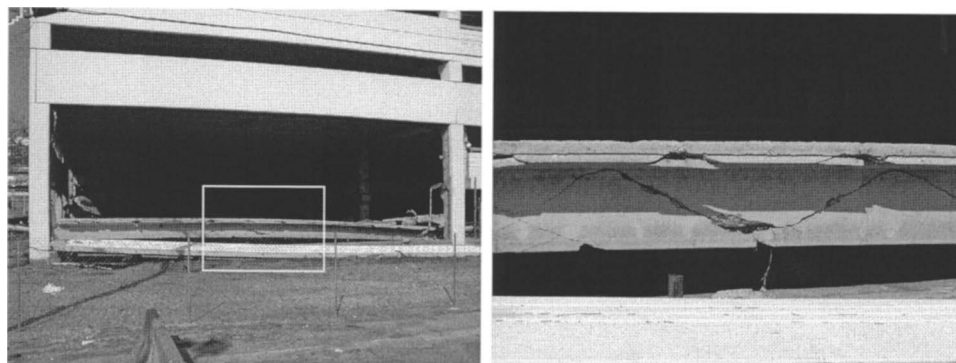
Double-tee negative bending failure—parking structure in Biloxi
